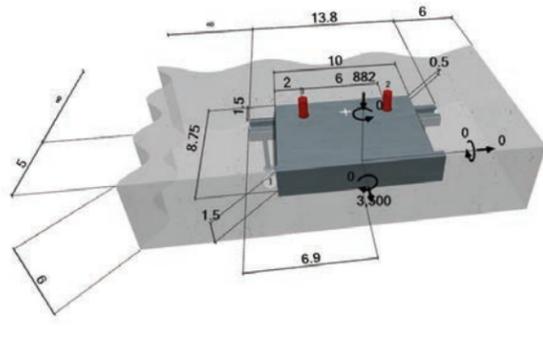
Design example – Profis anchor channel - 3D front View
